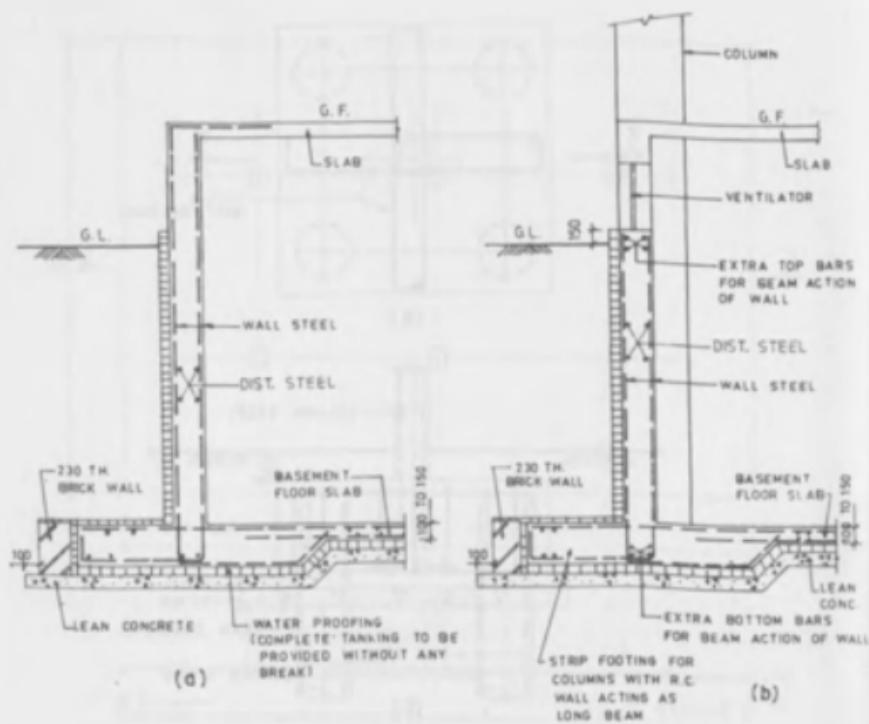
Detailing of basement retaining wall. (a) Basement retaining wall support G.F. slab; (b) Basement retaining wall with columns with ventilator at top.
